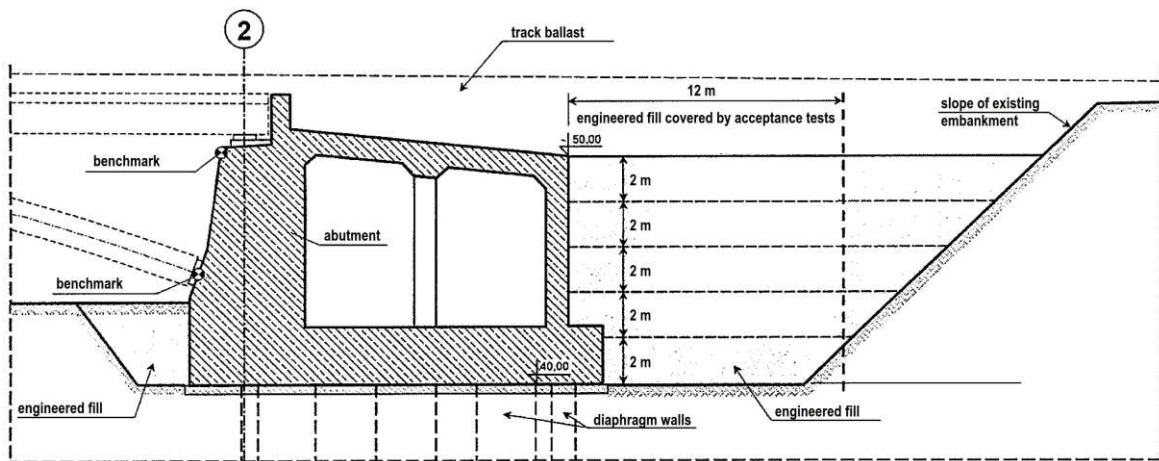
Abutment in axis 2. Scheme of fill execution behind the rear wall
